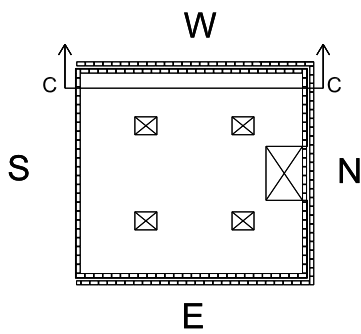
Linear potentiometer elevation: West calcium silicate inner leaf - Section C-C.
